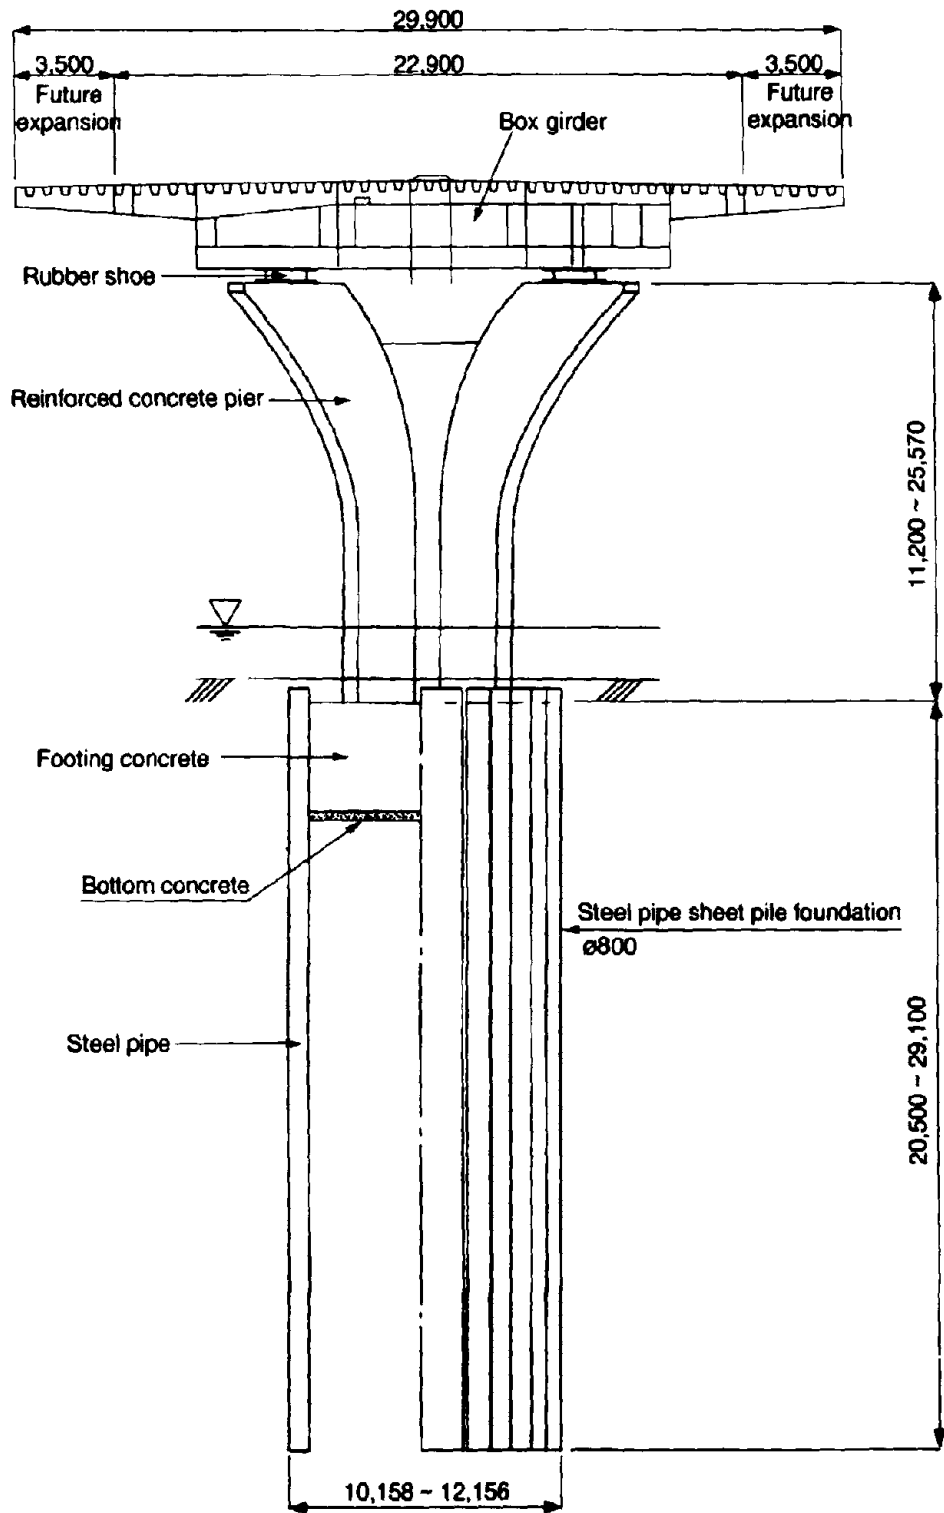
Superstructure and Substructure (Shallow Water Section)
